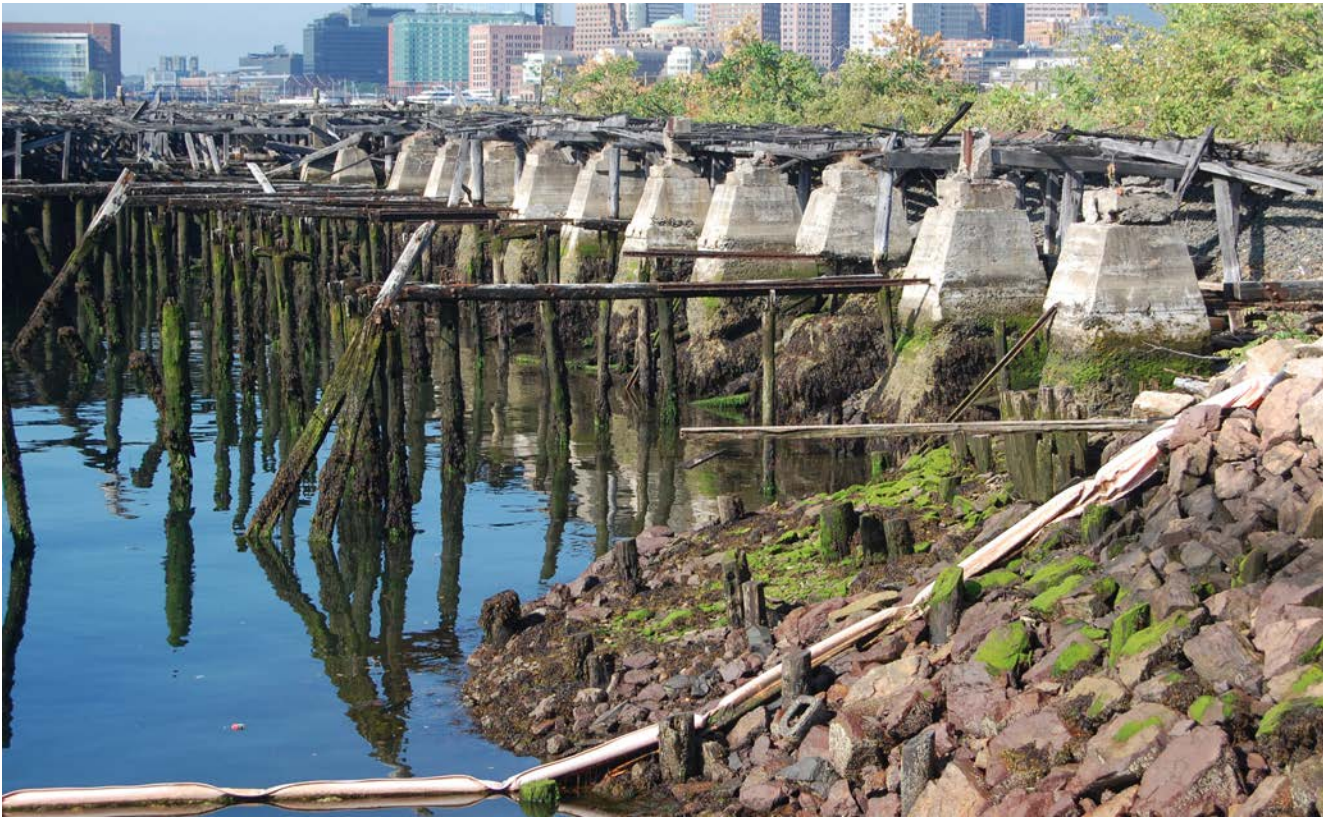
Looking southwest from the end of the concrete apron towards downtown Boston.
